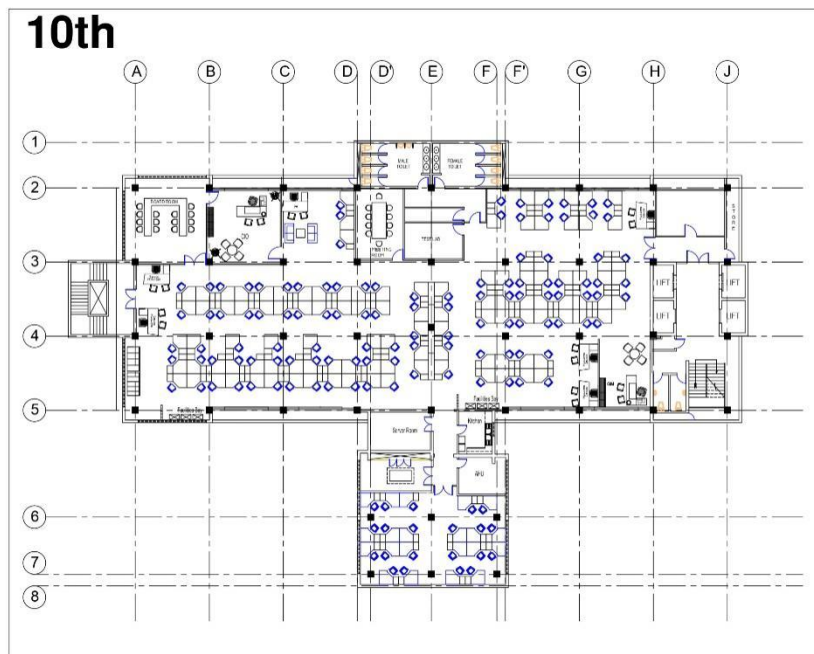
MTN PLAZA Office 10th Floor Plan
